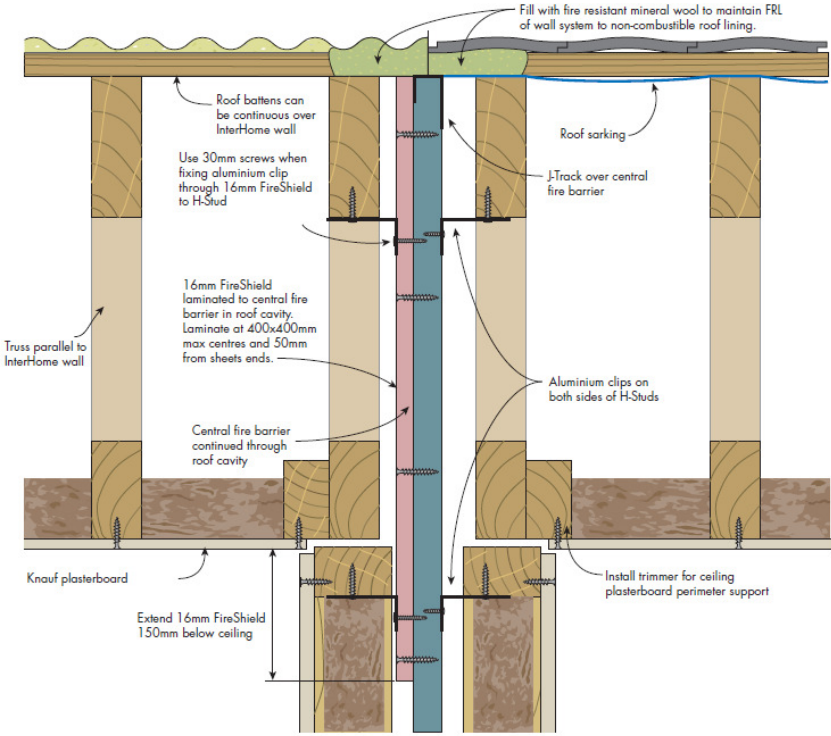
InterHome Wall with Parallel Roof Trusses FRL 60/60/60
